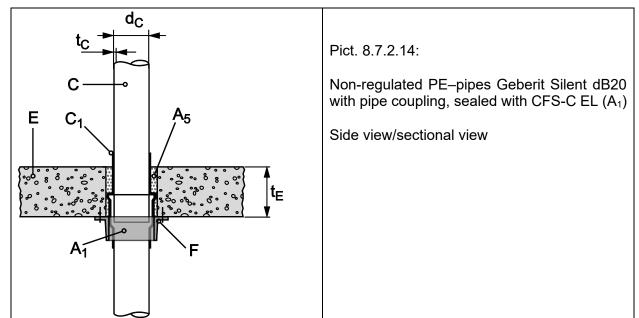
Geberit Silent dB20 pipe with pipe coupling, sealed in rigid floor
